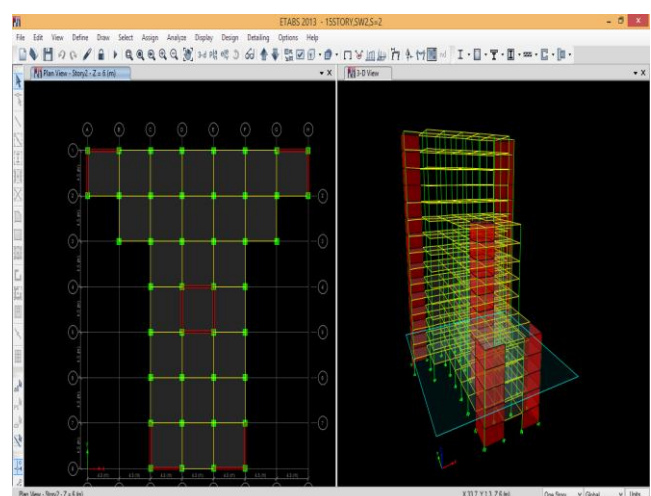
Plan and elevation of 15 storey building with shear walls considered at the corners and at the center with fixed base condition
